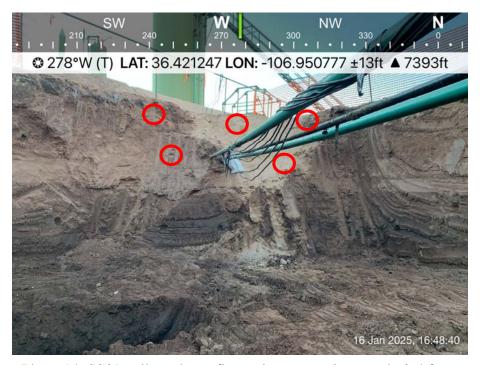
SS09 collected as a five-point composite sample 0-4 ft bgs from west sidewall of excavation.
